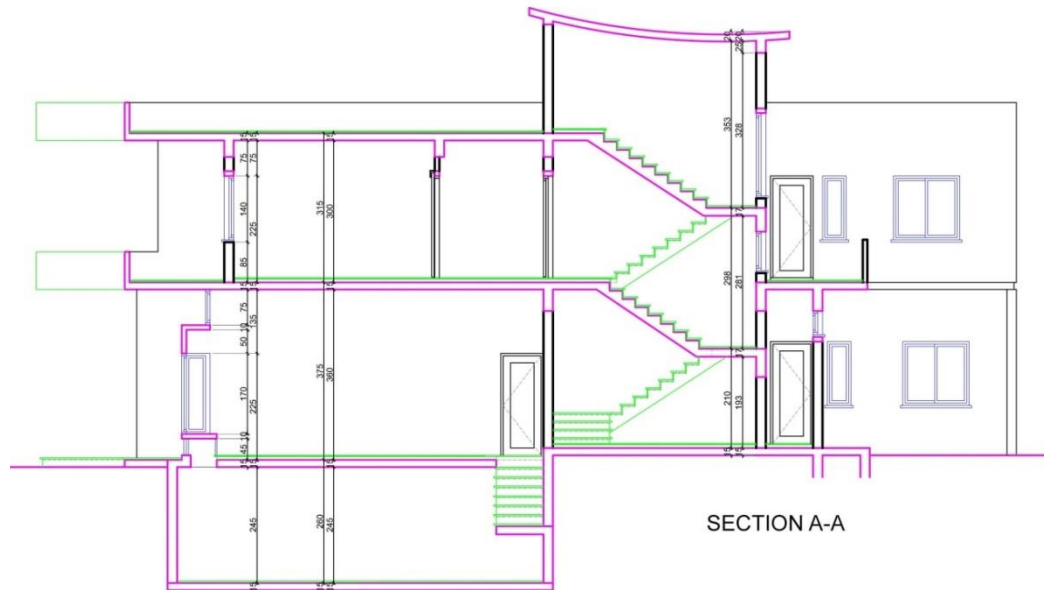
Section A-A of Efecan Building Complex; (Owner, 2019)
